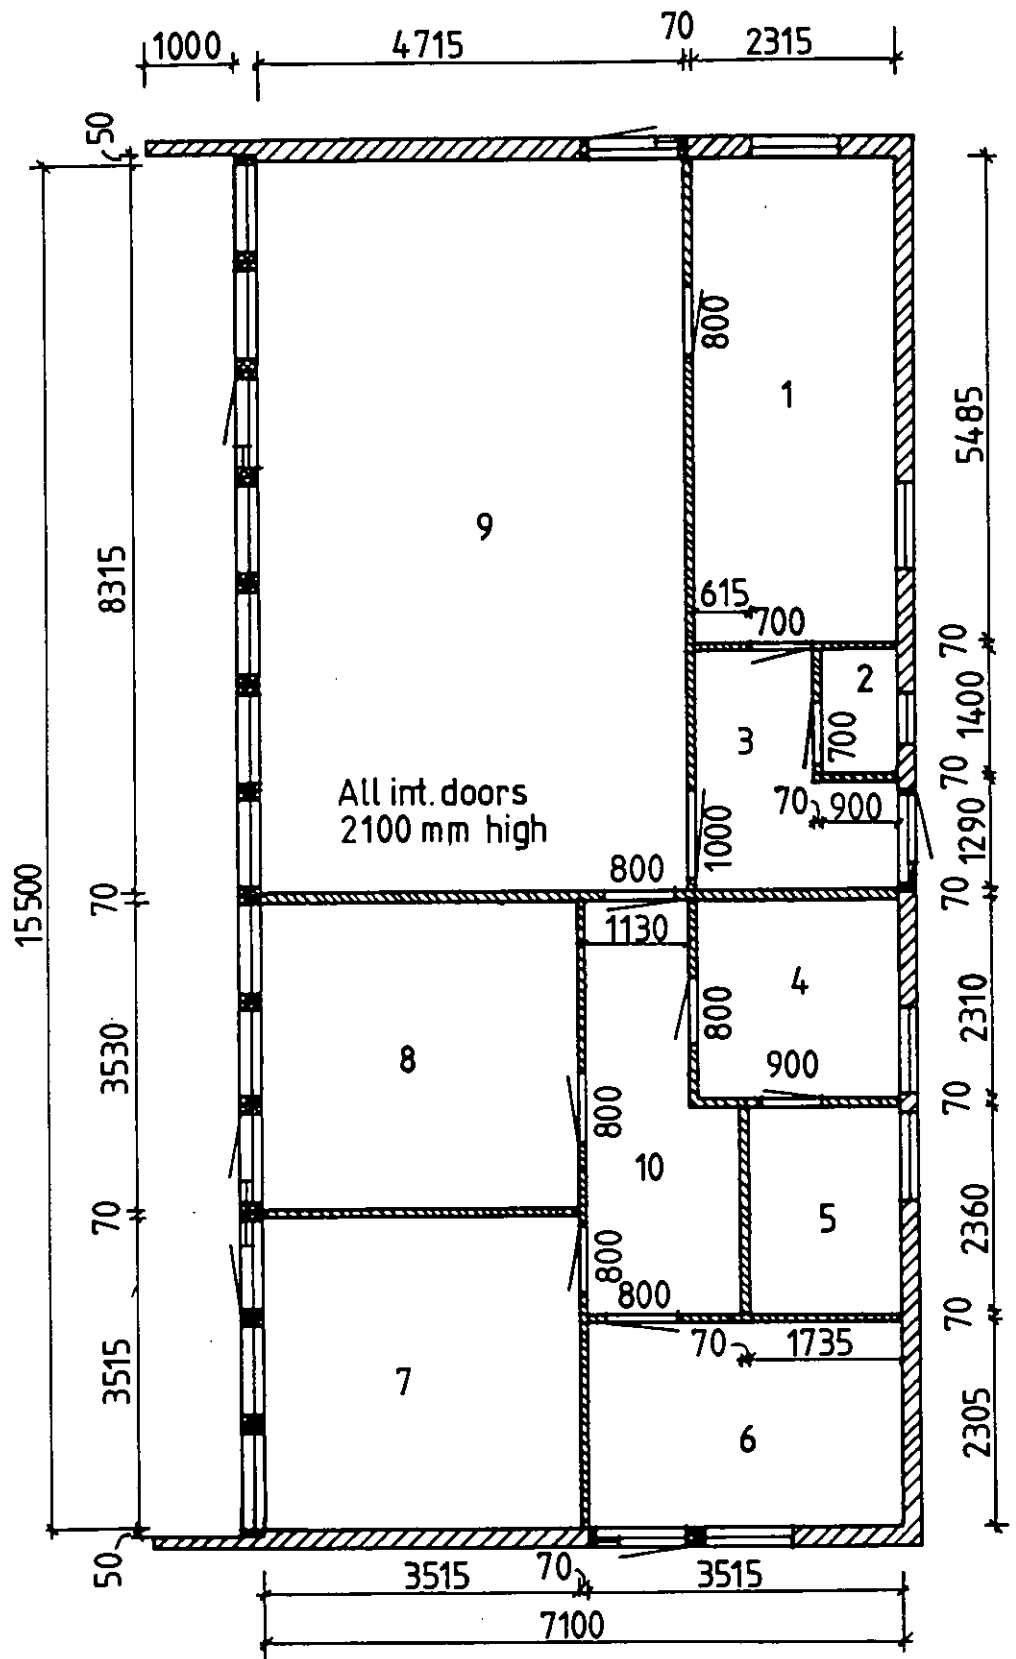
Plan and inner dimensions of the Vetlanda house.
